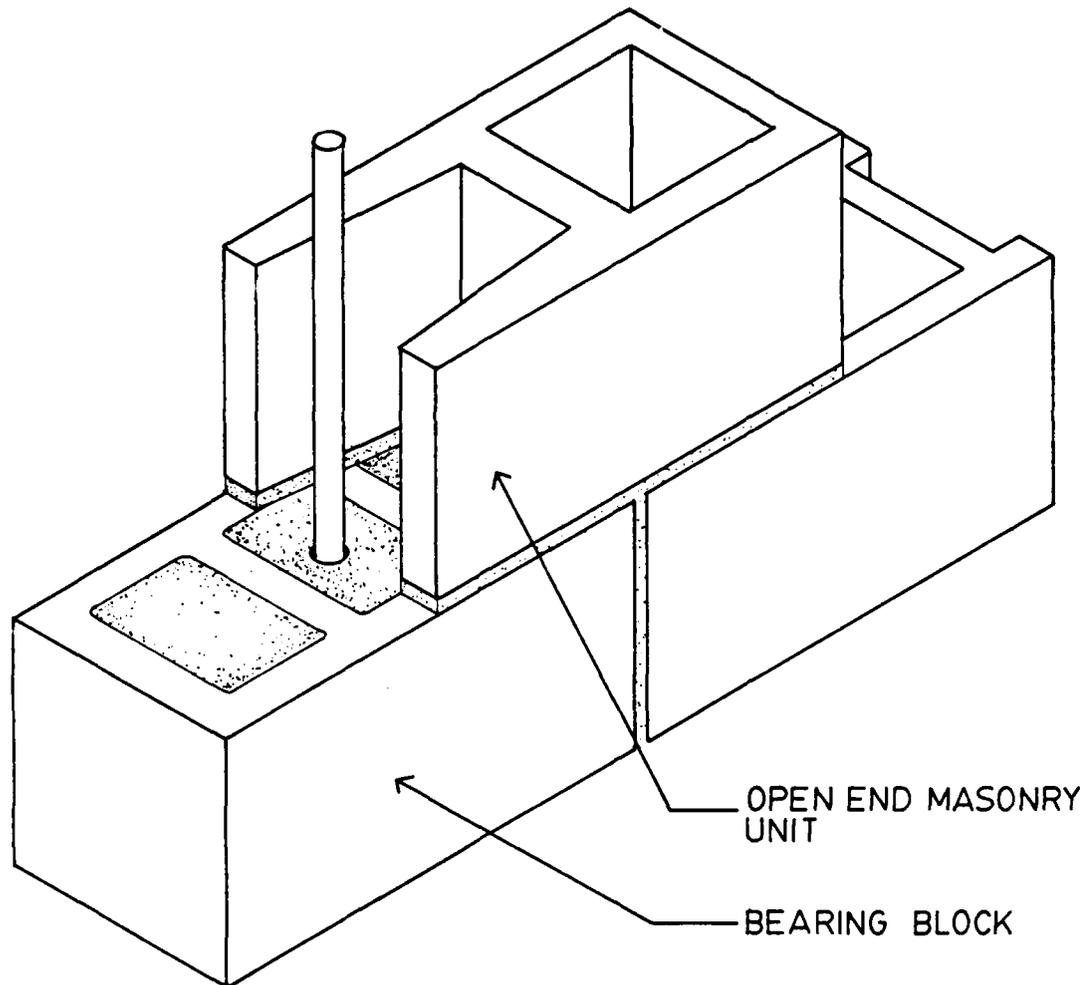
Detail of Masonry at Foundation Anchorage.
